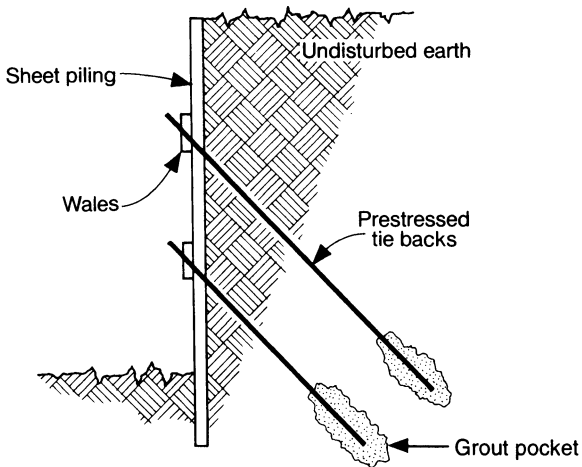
Typical detail of a steel sheet piling retaining wall.
